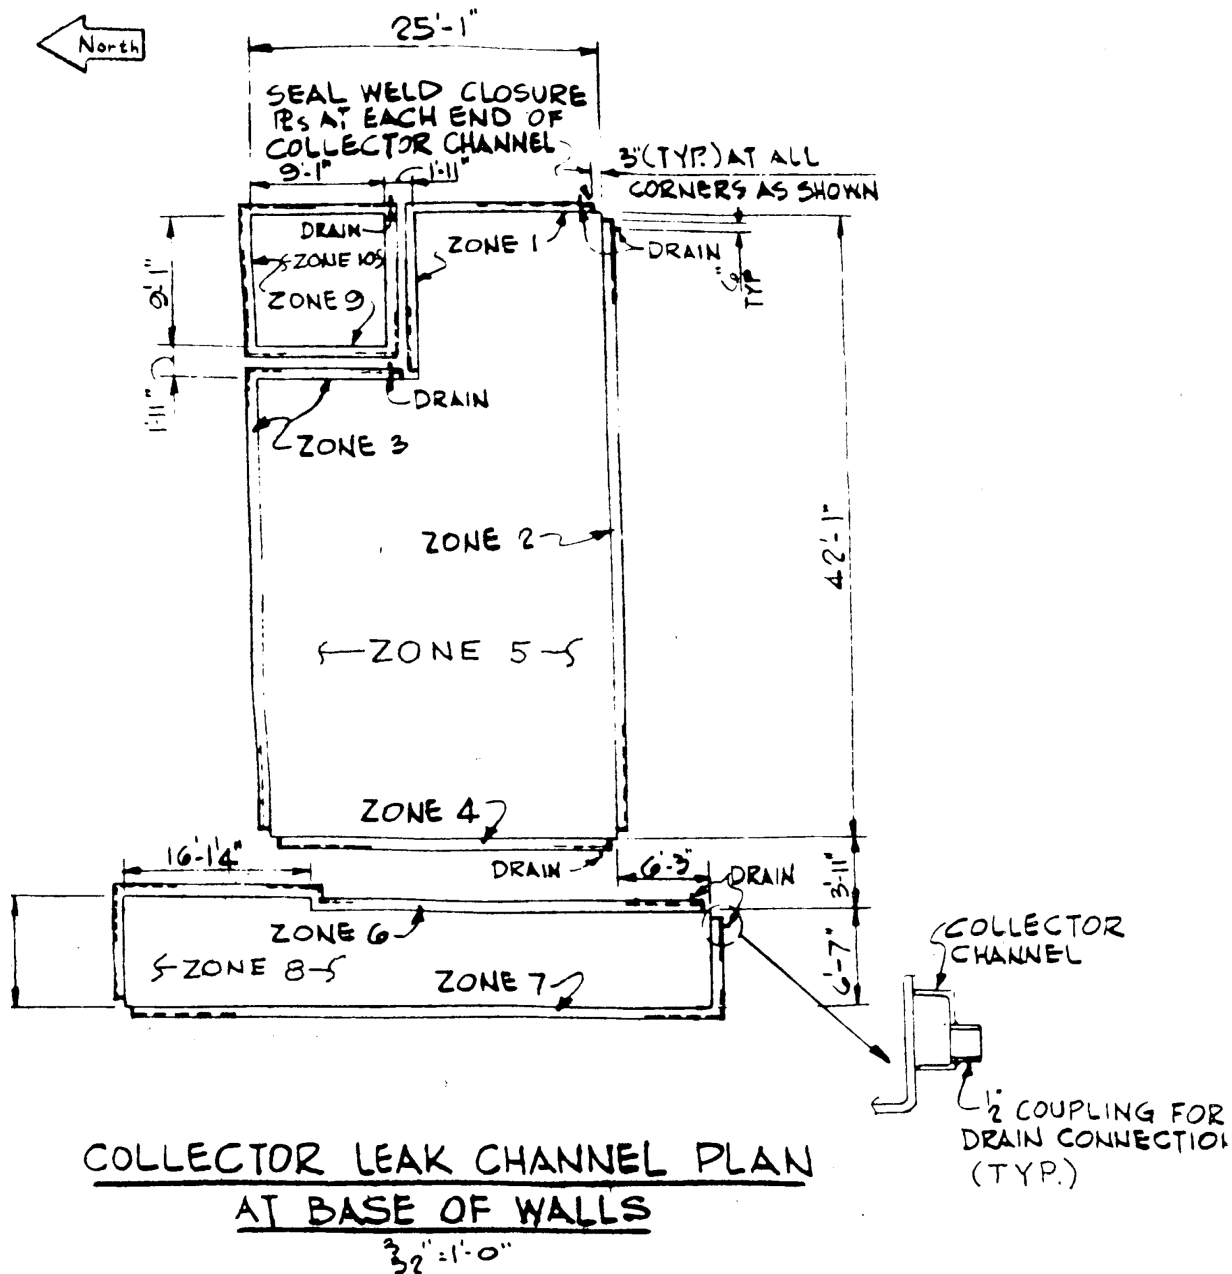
COLLECTOR LEAK CHANNEL PLAN AT BASE OF WALLS
